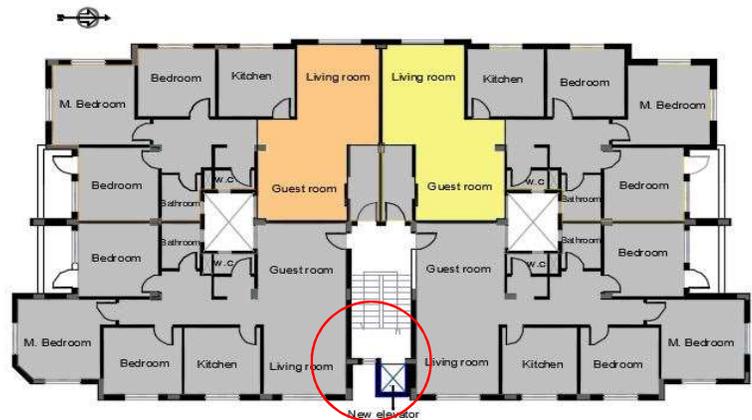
represents the typical plan of the case study building type 3 after adding an elevator.
